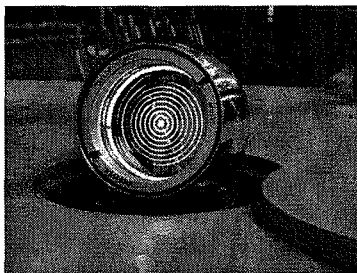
Reference point monument embedded in cavern floor. Protection plate level with floor.
